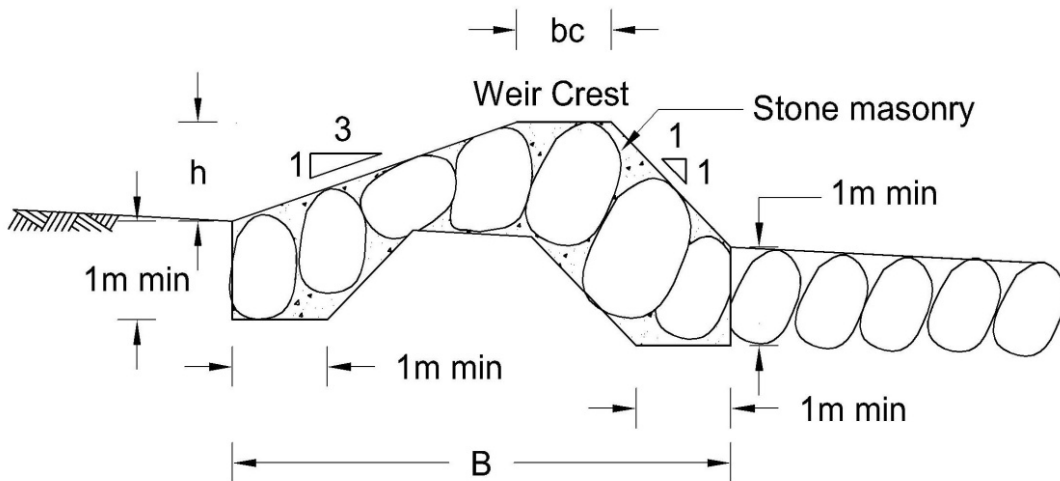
(B): Cross-sectional view of stone masonry weir
